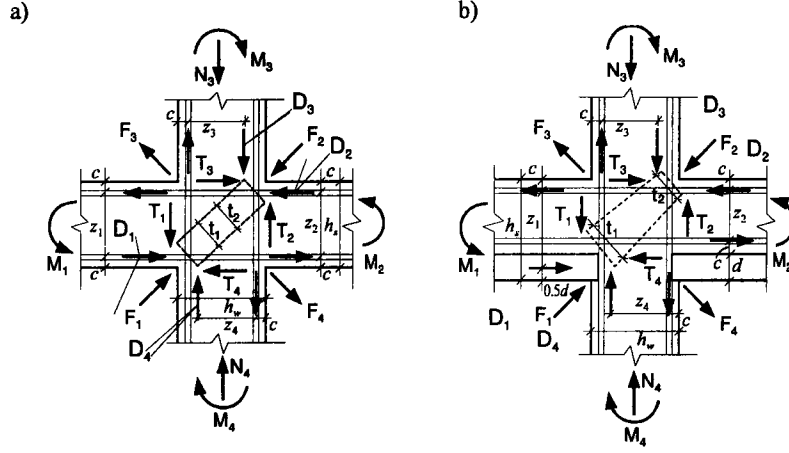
Inner forces in joint core of slab-wall connections with pure cast-in-situ (a) and composite (b) floor slabs
